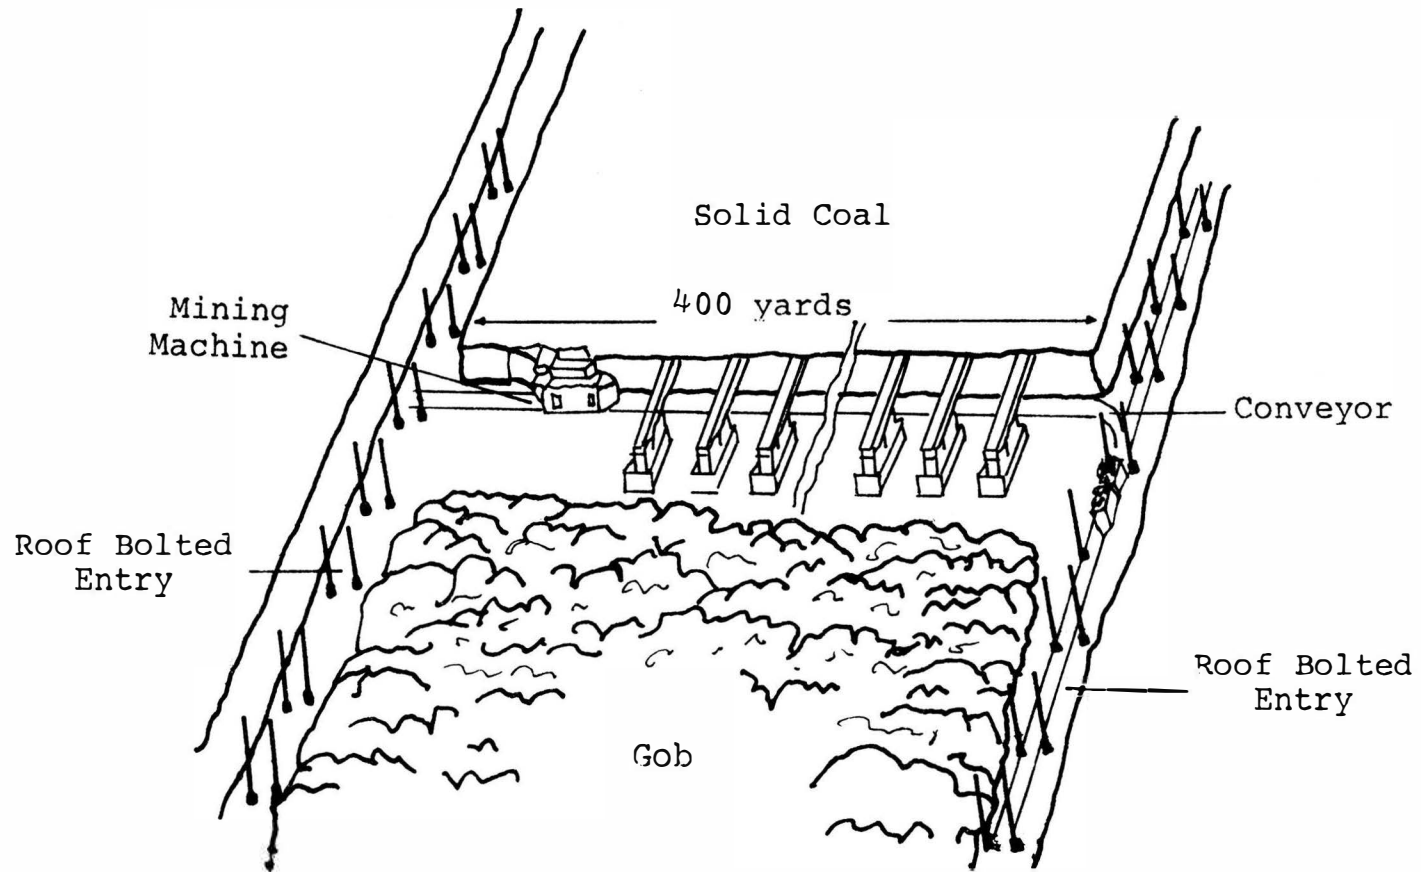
Simplified Equipment Layout for a Longwall Face (5).
